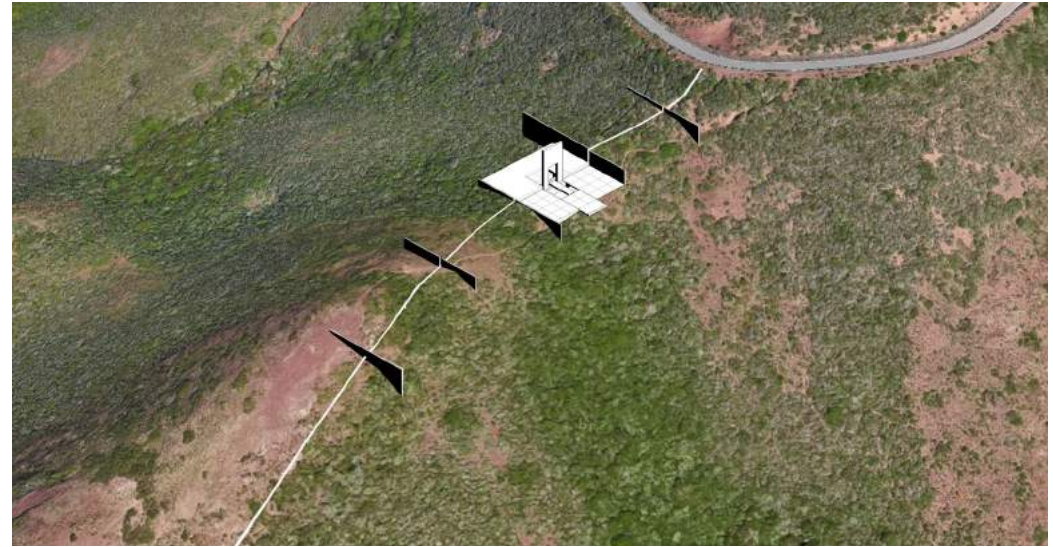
SITE PERSPECTIVE WITH PROPOSED DESIGN
